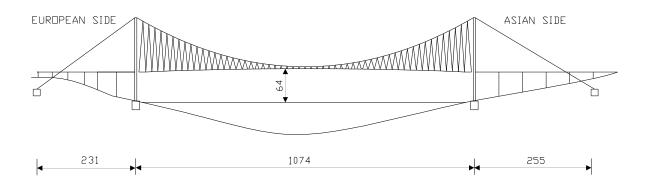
Bosporus Suspension Bridge and its schematic representation (dimensions as m)
